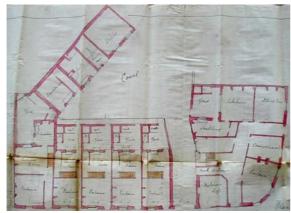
Plan of The Bull public house, built in 1866, with adjoining butcher's shop and terraced houses
